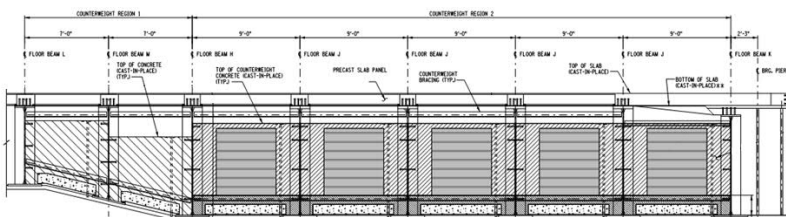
Phase 2 Main bridge - Back Span Counterweight Layout
